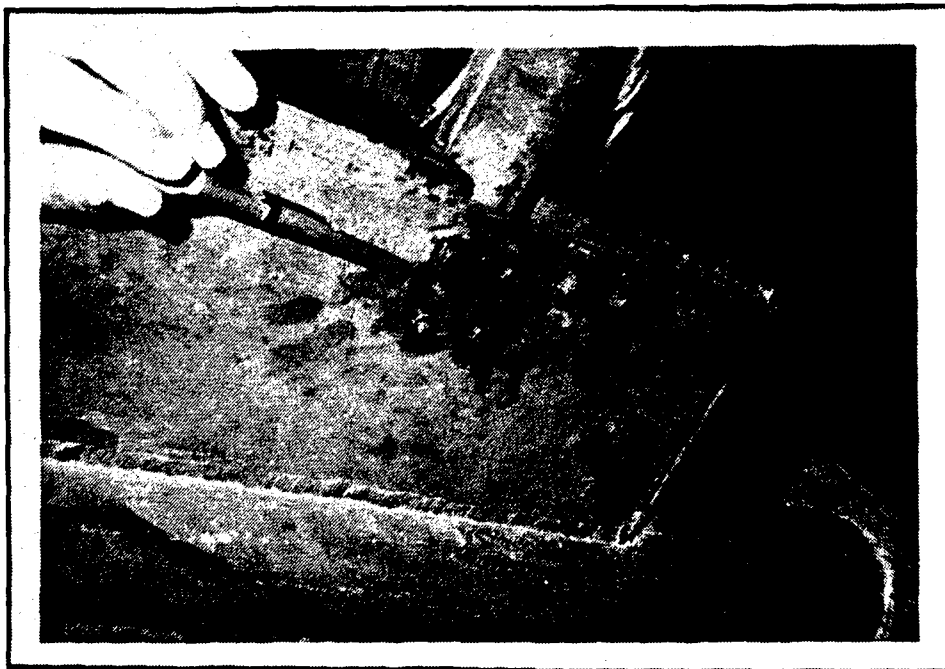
Example of bearing cover plate showing how water leaks into bearing. (Note: No gaskets are used under the cover plate. Also note that crews need additional tools to remove both the bolts and covers.)
